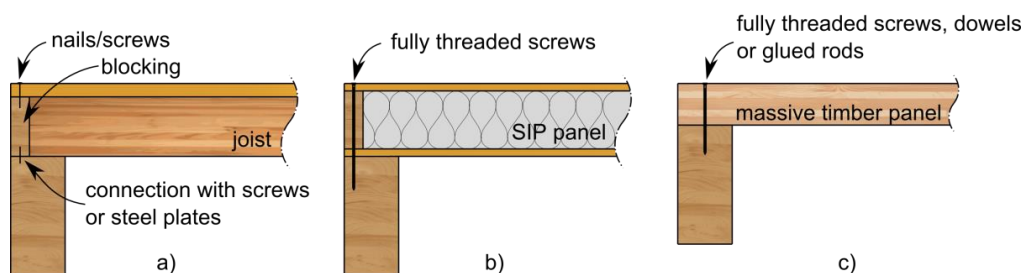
Suggested diaphragm to frame connections (floor joists on top of beam): a) floor joist sitting on beam – additional blocking required, b) Structural Insulated Panel (SIP) on beam, c) solid timber floor on beam
